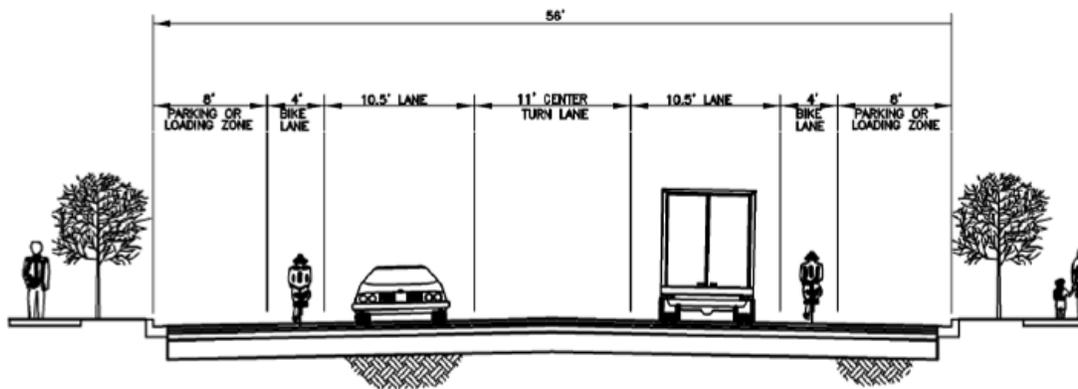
Proposed Highway 1416 Section with Bike Lanes.
